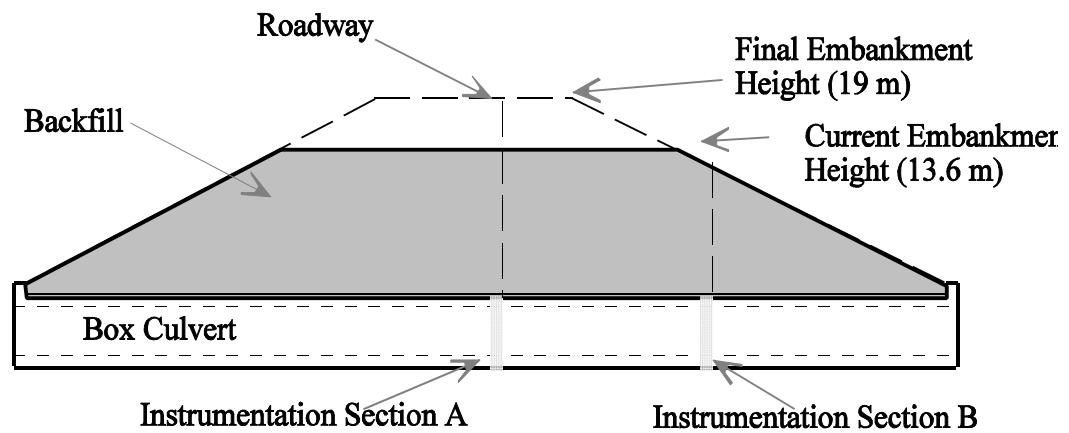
Schematic of Embankment and Culvert Cross-Section with Typical Sections A and B
